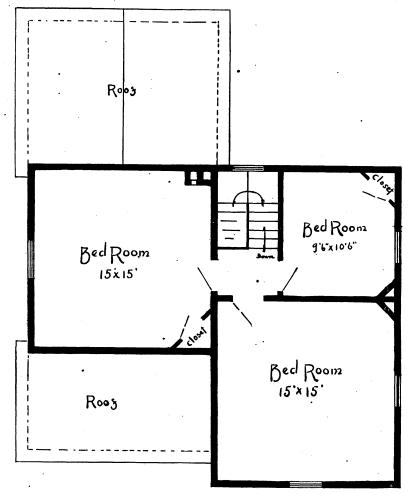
Second floor of \$600 farm house with \$500 addition. (Design No. 1.)
